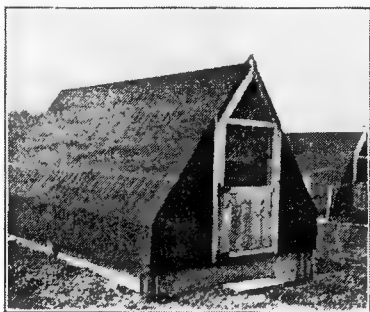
Colony house used by J. H. Curtiss, West Norwell, Massachusetts
